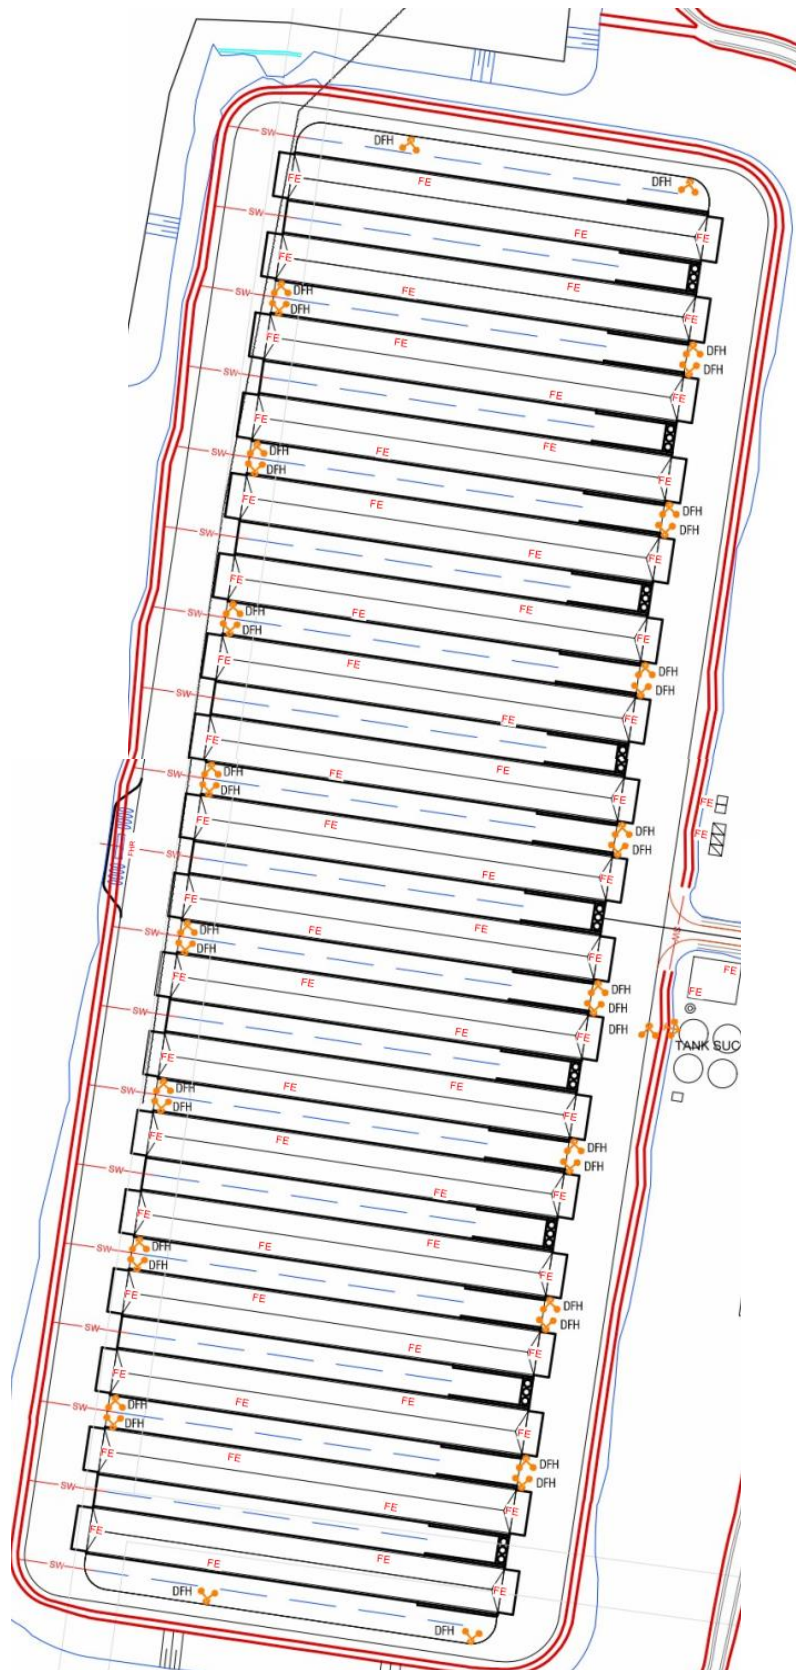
Farm 2 - Fire hydrant and fire extinguisher layout
